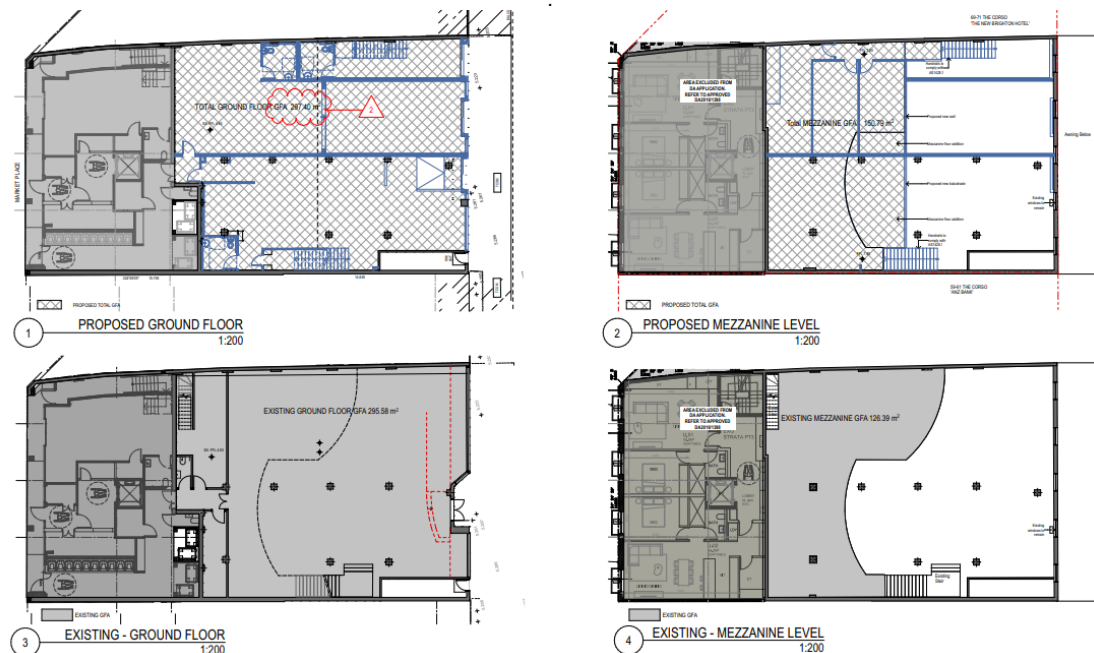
Proposed ground floor and mezzanine level (Source: Grain Architects)
